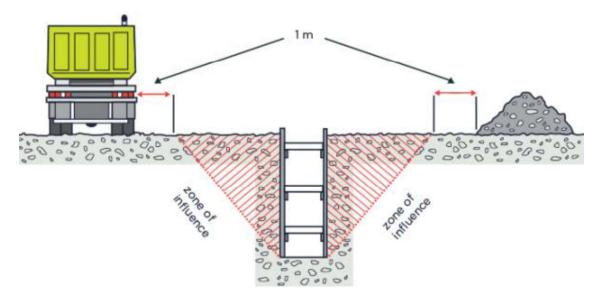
Examples impact of loading or surcharge on ground in proximity to open excavations.¹⁴
